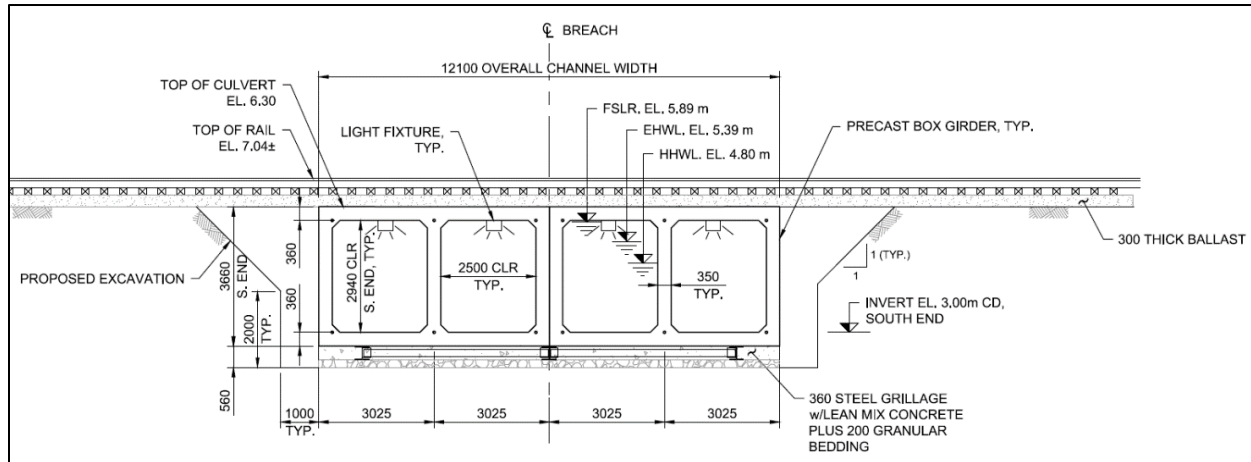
Location 3 Channel Section (Culvert) Below Existing Causeway Tracks
